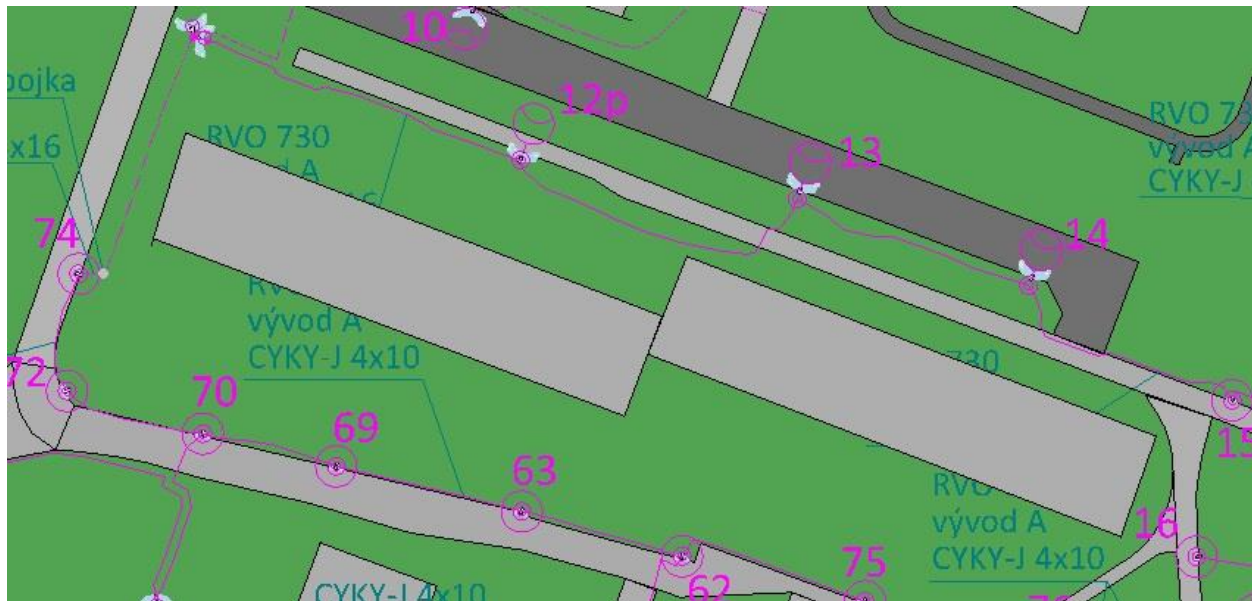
BUILDINGS, PAVEMENTS, GRASS, ROADS AND LAMPS DESIGN
